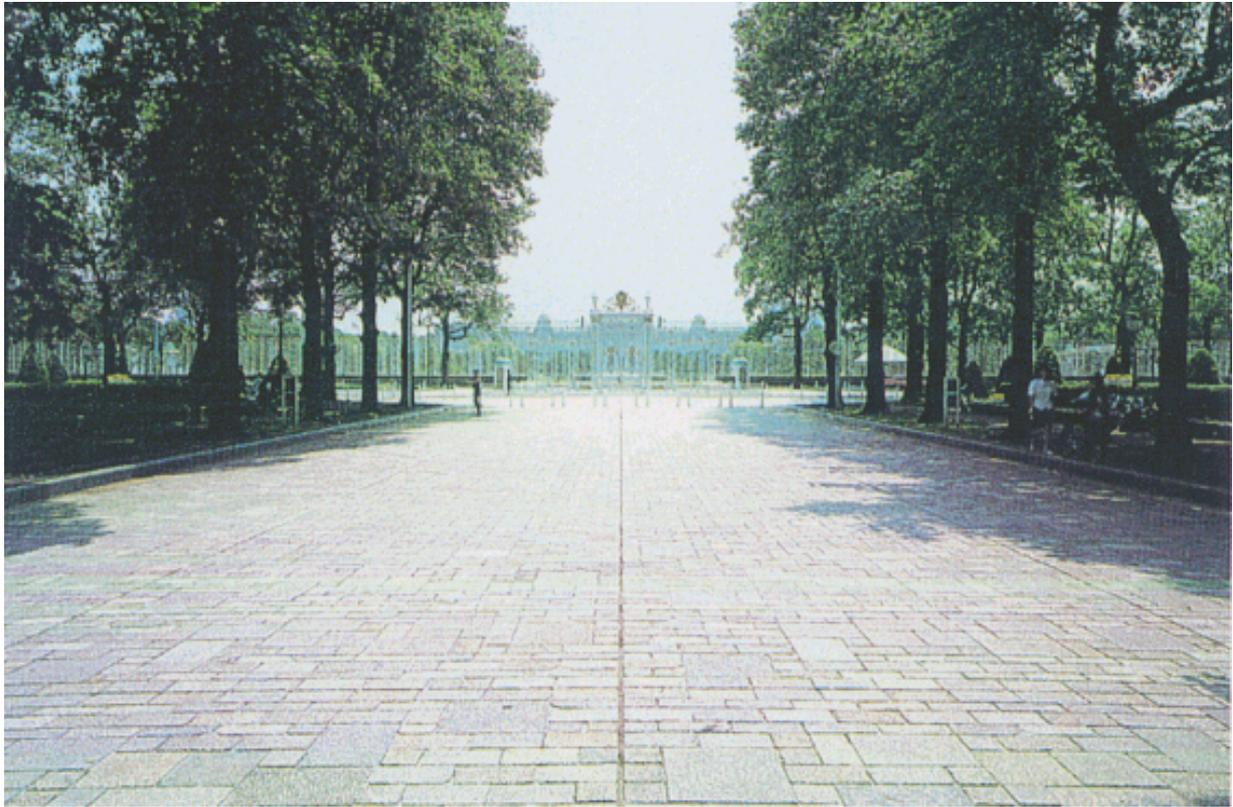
Stone pavement in front of Akasaka Detached Palace in Minato Ward, Tokyo
